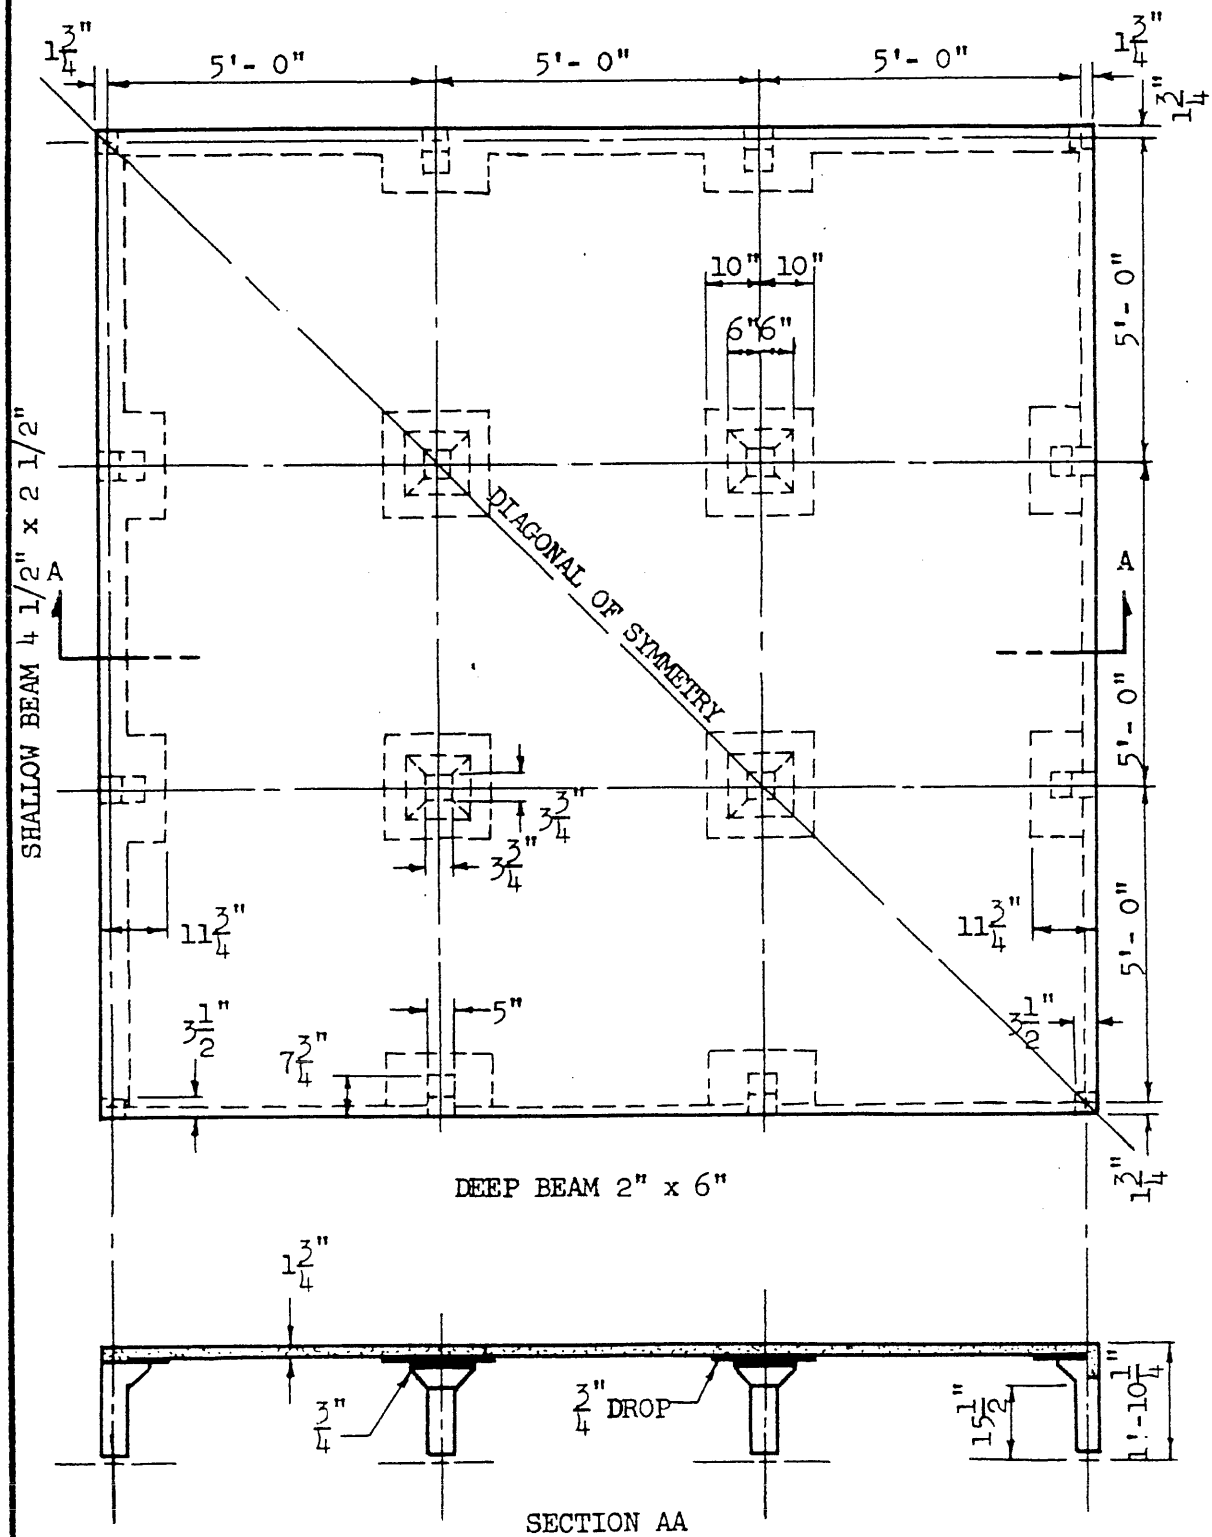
LAYOUT OF NINE-PANEL REINFORCED CONCRETE FLAT SLAB
